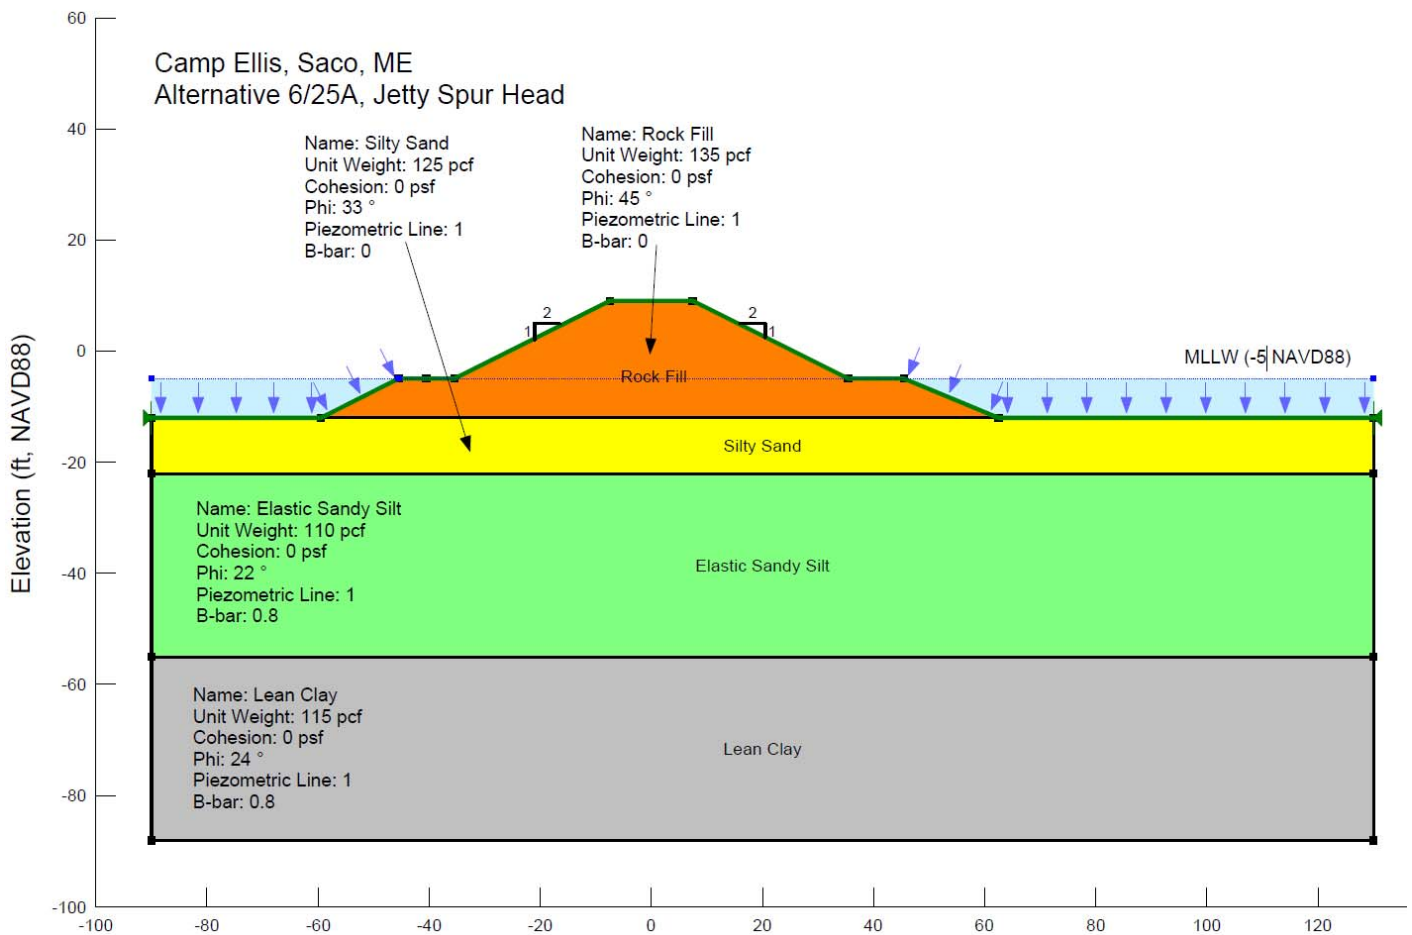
SLOPE/W Model, Jetty Spur Head Section
